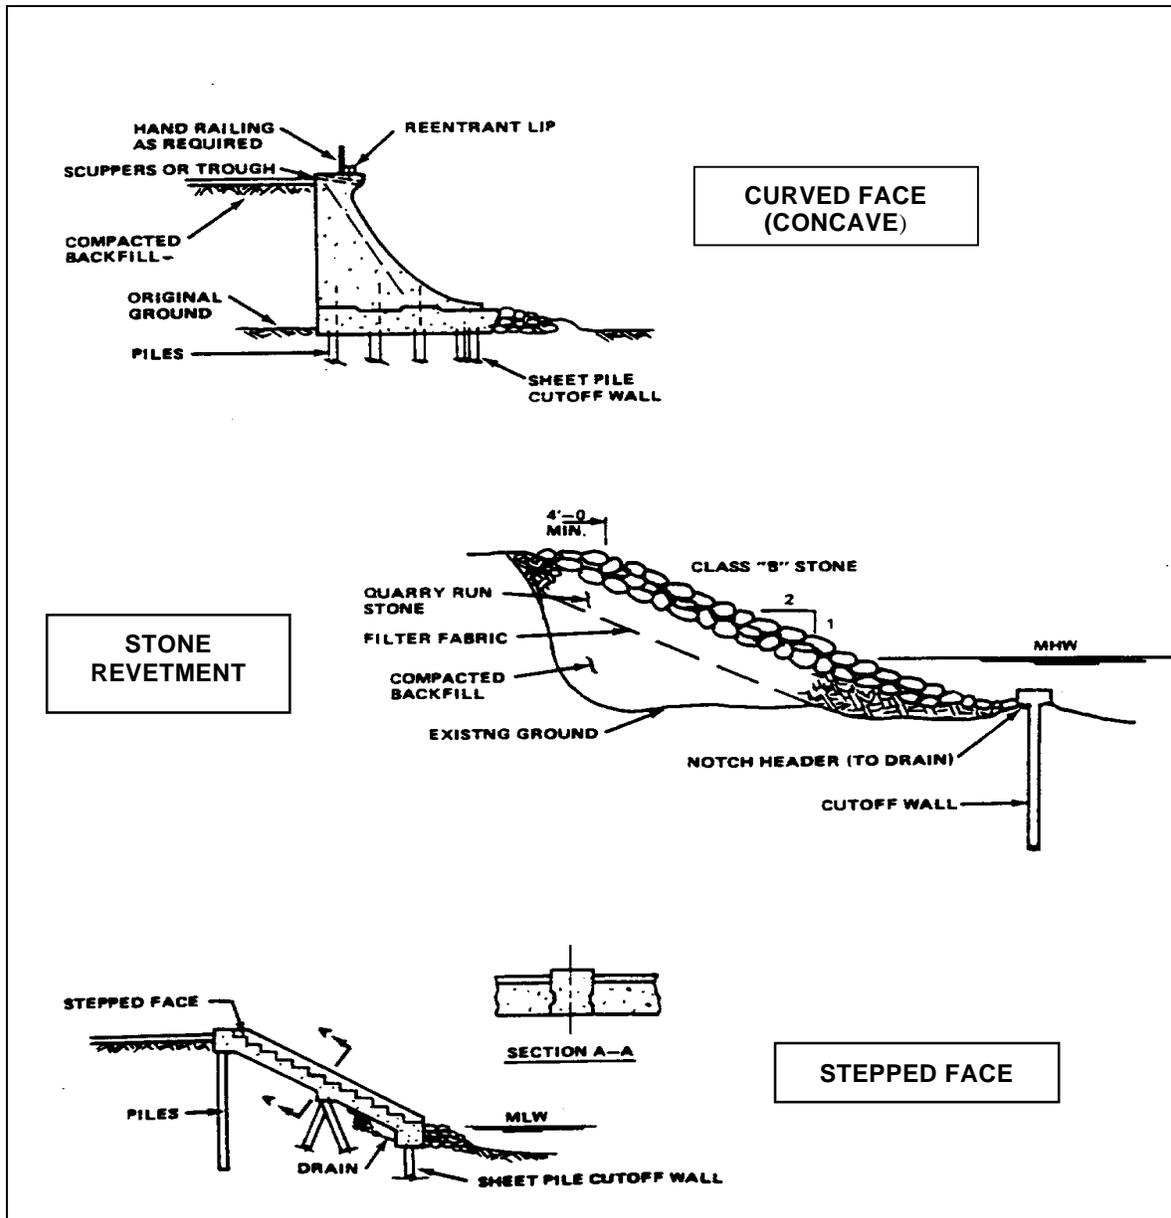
Curved Face, Stone Revetment, and Stepped Face Seawall Configurations.
